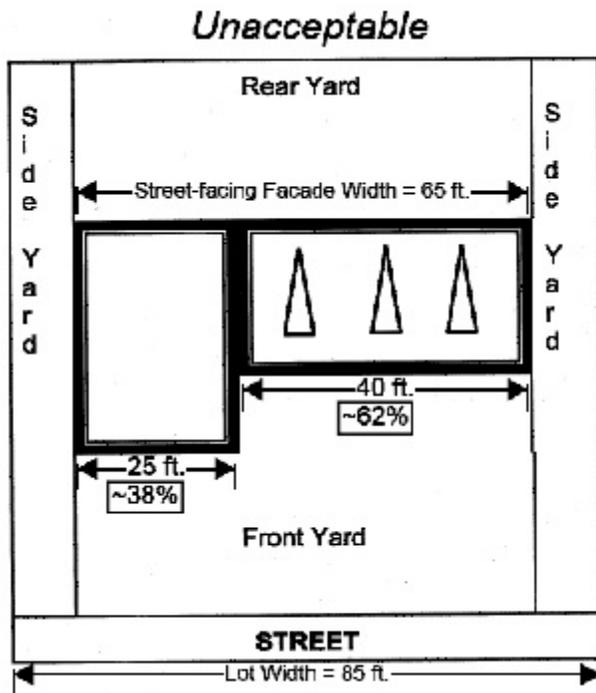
A - Unacceptable Width of Street-facing Garage on a Lot >50 ft. Wide
